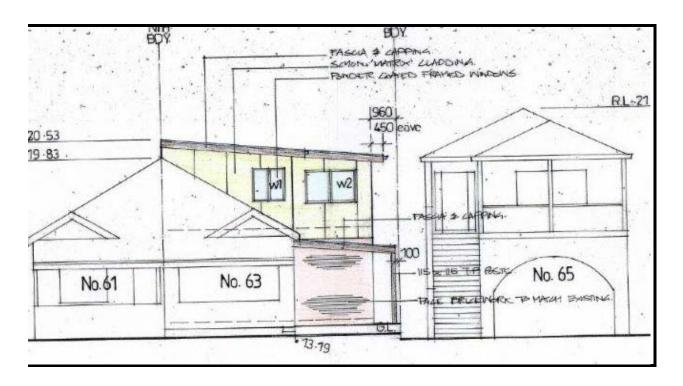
Proposed Streetscape Elevation (Source: Peter Banfield, 3 July 2017)
